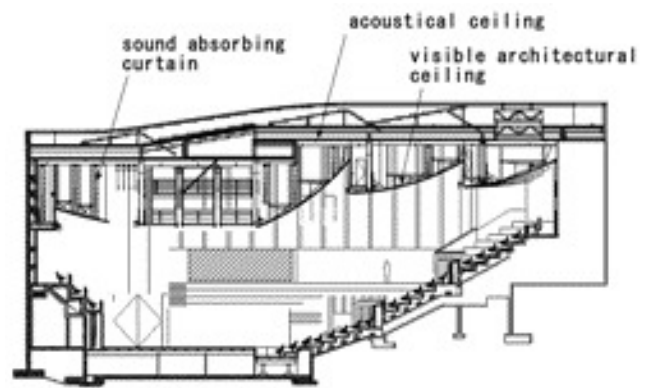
Cross-section drawing of visible architectural ceiling, acoustical ceiling, and sound absorbing curtains
